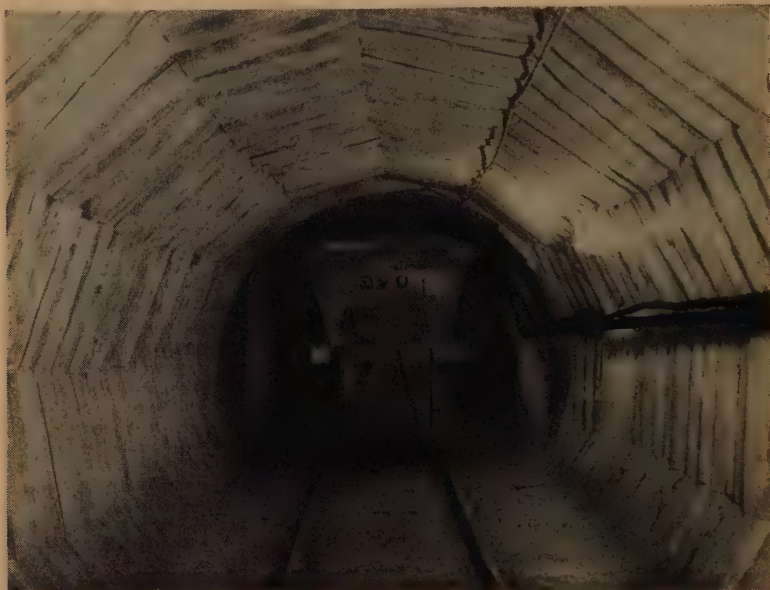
WOOD-BLOCK LINING FOR HEAVY GROUND.
